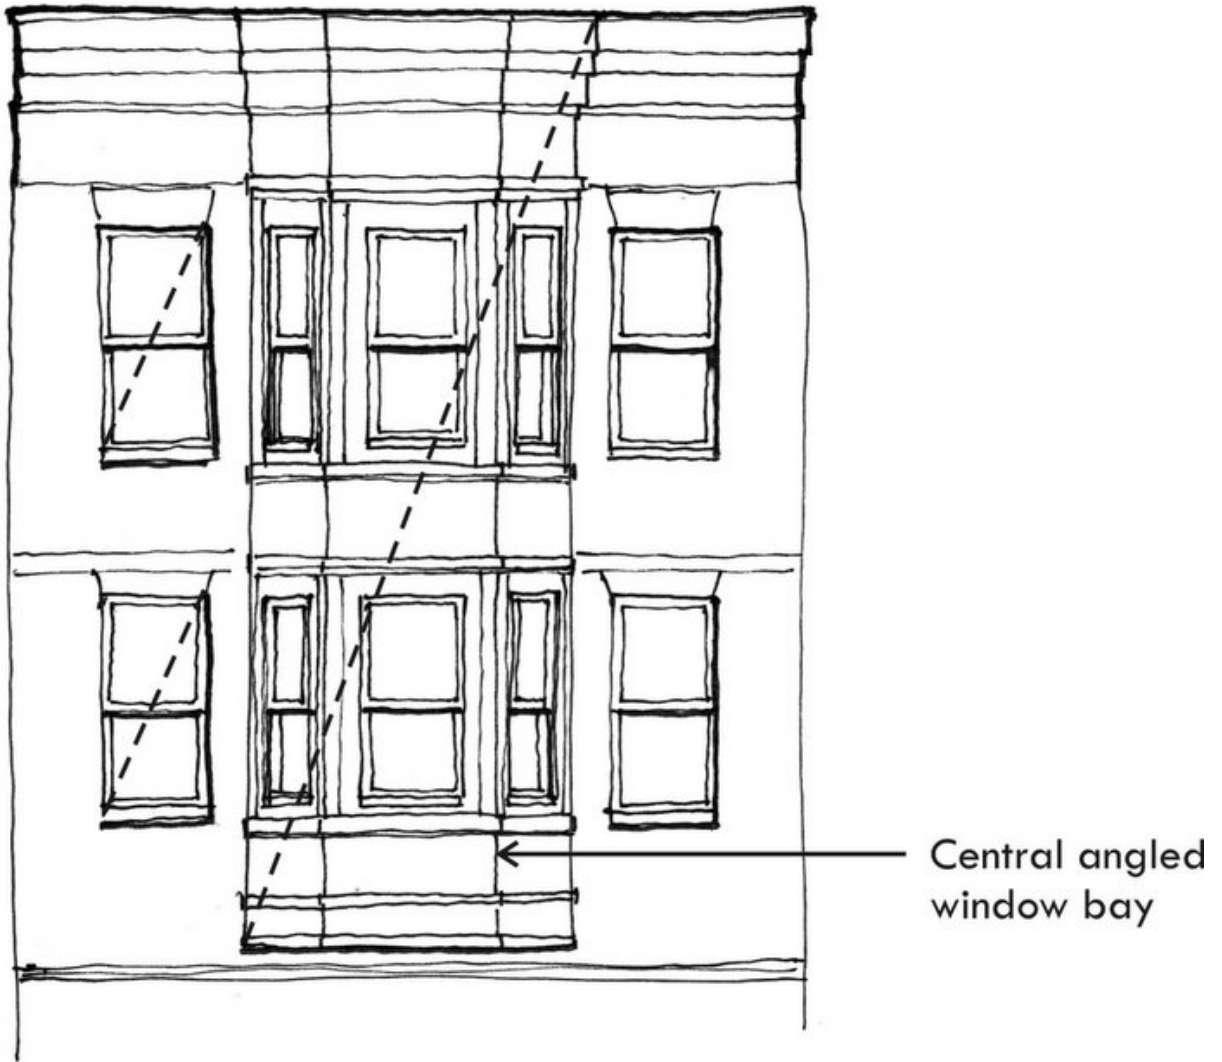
Image G: The upper floors should have vertically proportioned windows and wall elements, often with piers, pilasters and bays.
